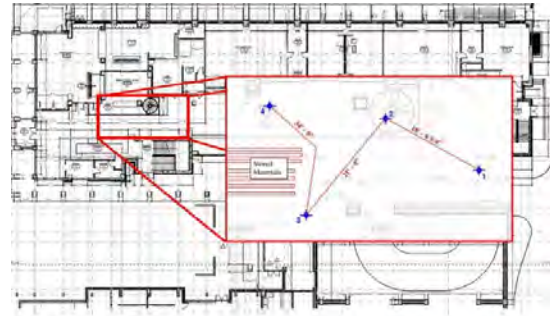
Four scan locations on project floor plan w/ distances between markers.
